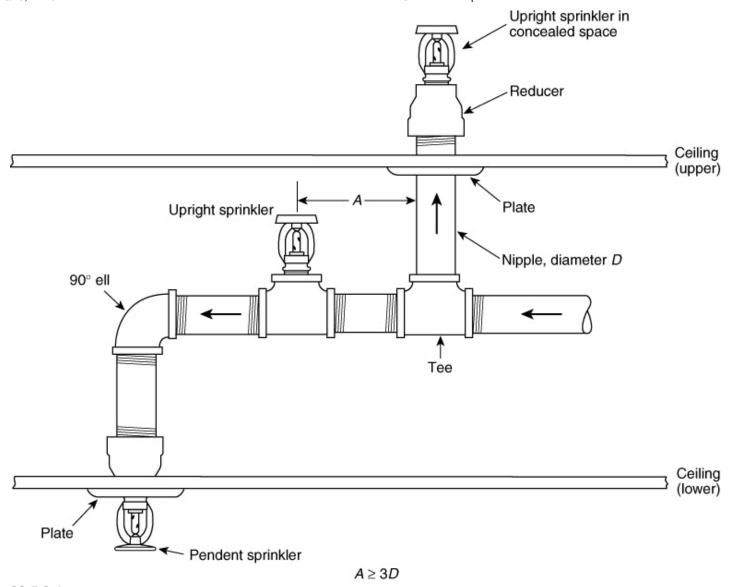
(c) Arrangement of Branch Lines Supplying Sprinklers Above, Between, and Below Ceilings.
